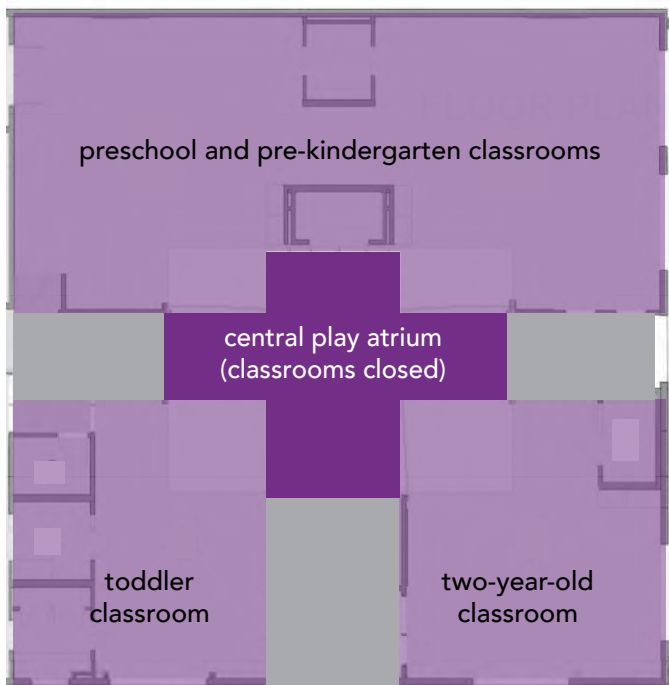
Central play atrium diagrams; Floor Plan Source: Harley Ellis Devereaux
